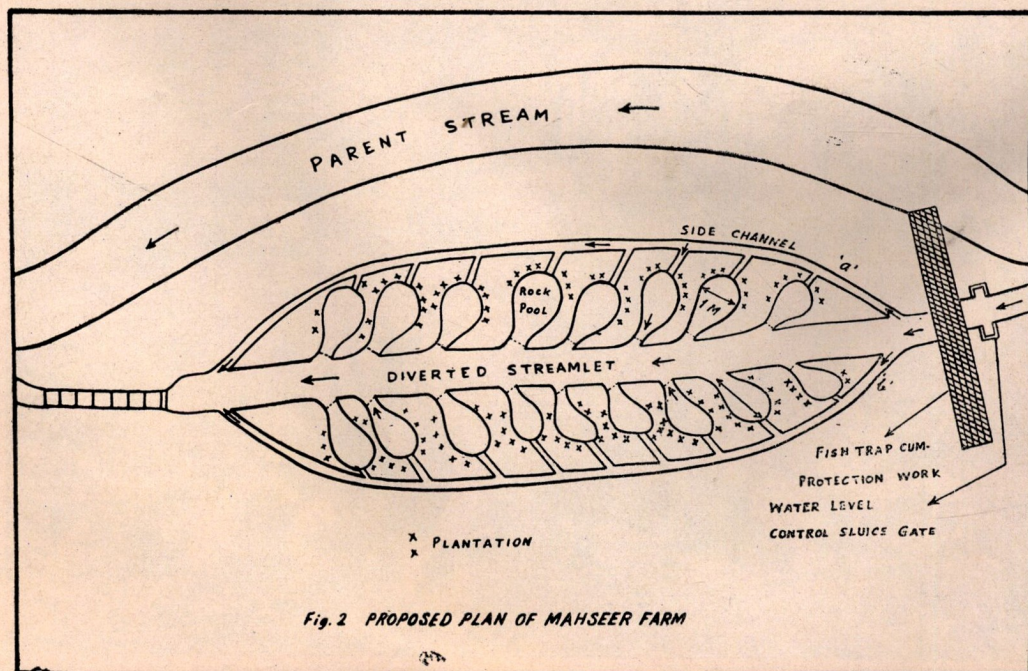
PROPOSED PLAN OF MAHSEER FARM
